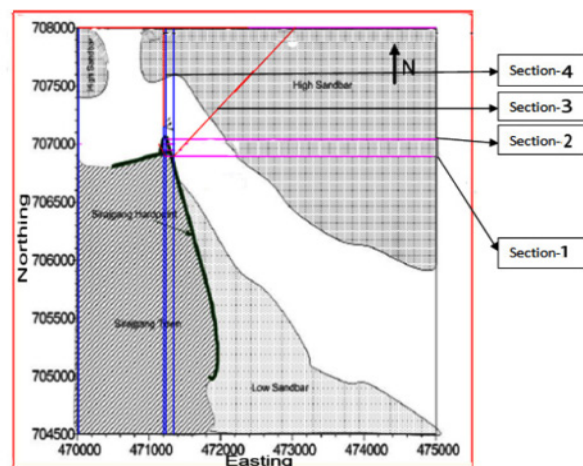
Plan of Sirajgonj hardpoint showing different sections. (Source: BWDB)
